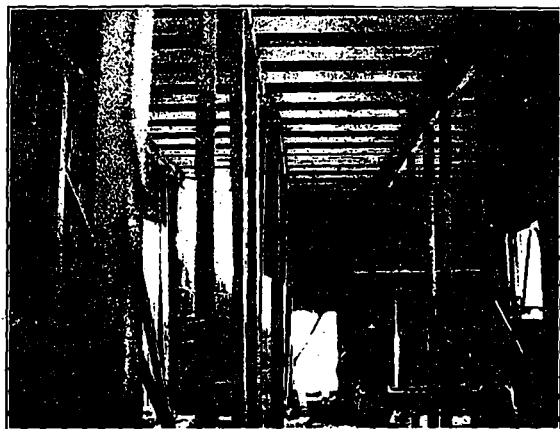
Lower Form Work for Floors, with Supporting Uprights and Stringers.
